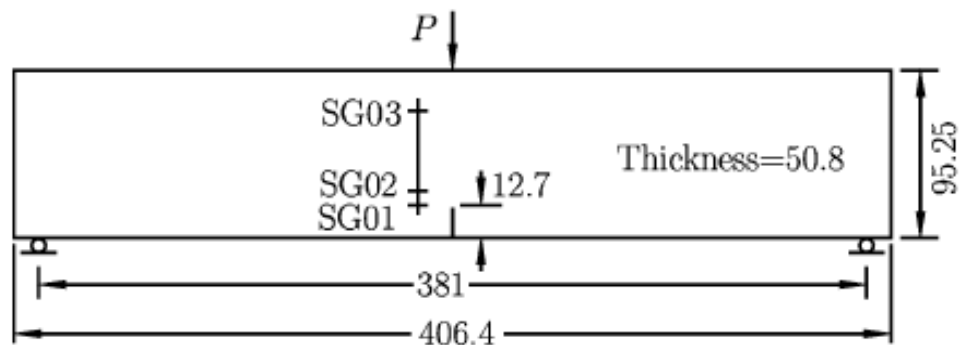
Impact test of a concrete beam (unit: *mm*) Su et al. 2010.
